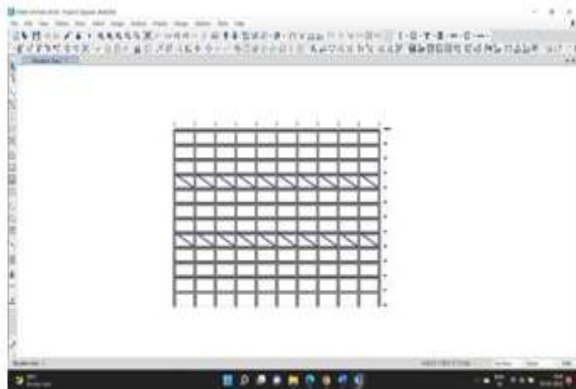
Elevation View of Diagonal Type of Bracings Model
